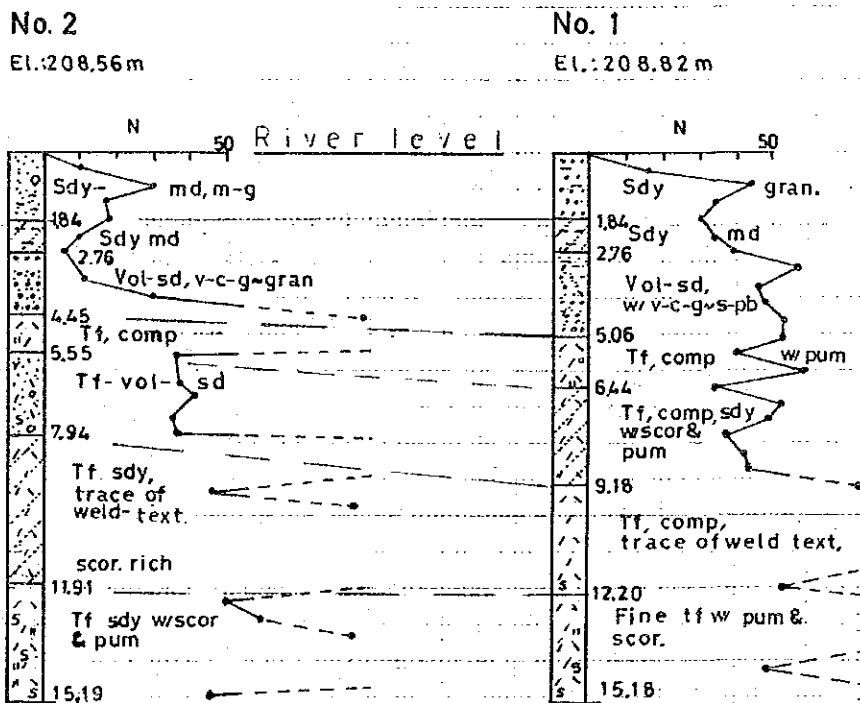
Soil Profile at the Mayari Bridge Site, Nandaime
